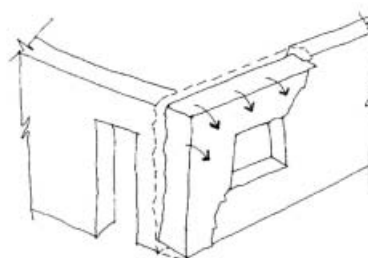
A localized section of an adobe building may become unstable when the cracking pattern permits isolated wall sections to form which can lead to collapse.
